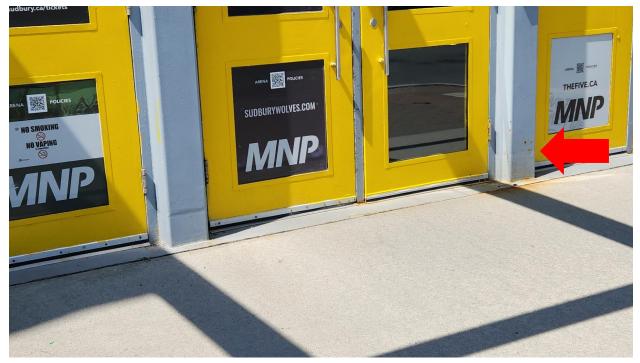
Evidence of continued corrosion to exposed steel columns at the northeast stair addition (c.2000).
